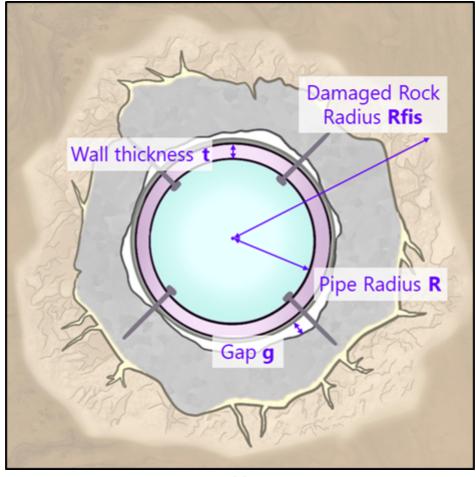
Layout of a pressure tunnel with a steel liner and all components.
